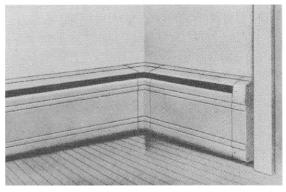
Installing corner and enclosures. (Courtesy Vulcan Radiator Co.)
